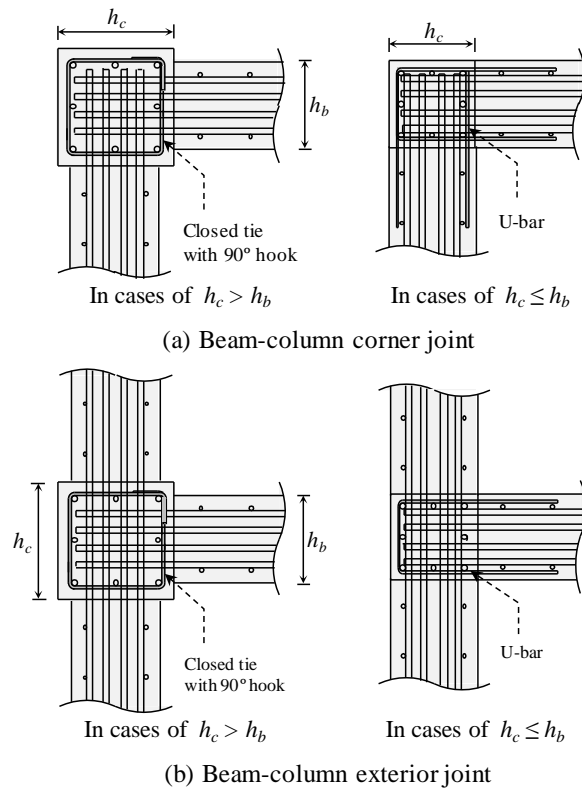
Joint shear reinforcement details according to beam and column depths
